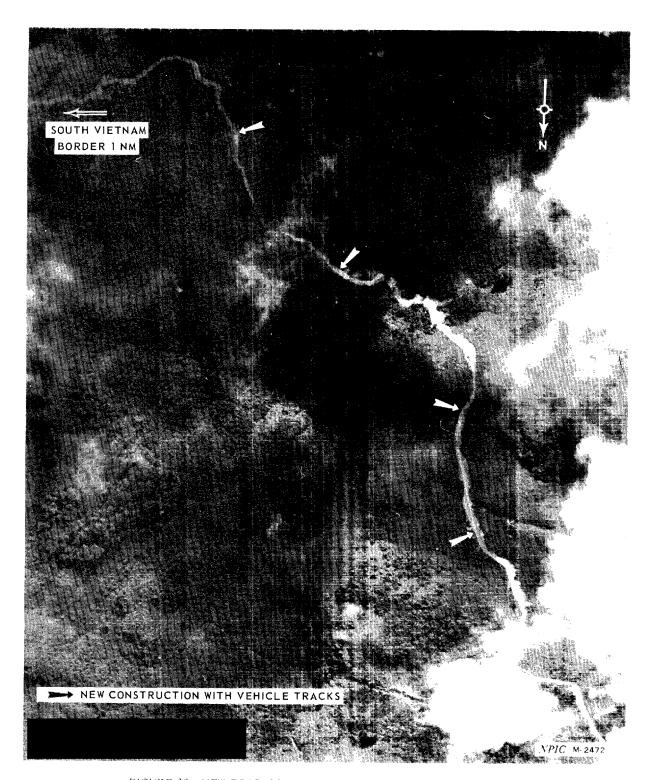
NEW ROAD CONSTRUCTION, ROUTE 165 AREA, LAOS
